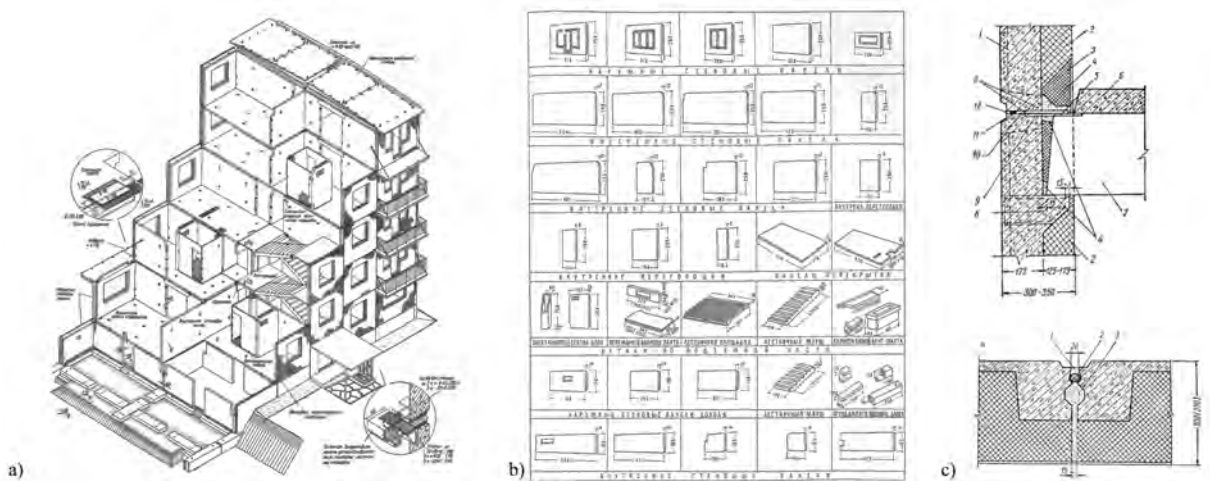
I-464 type: a) axonometric view of the building (1957); b) construction panels; c) constructive details.
